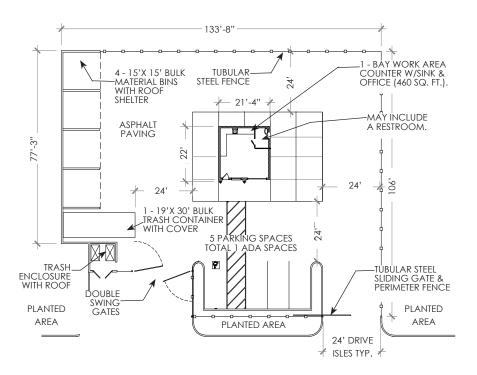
Preferred Small Maintenance Building and Yards Layout Diagram -
